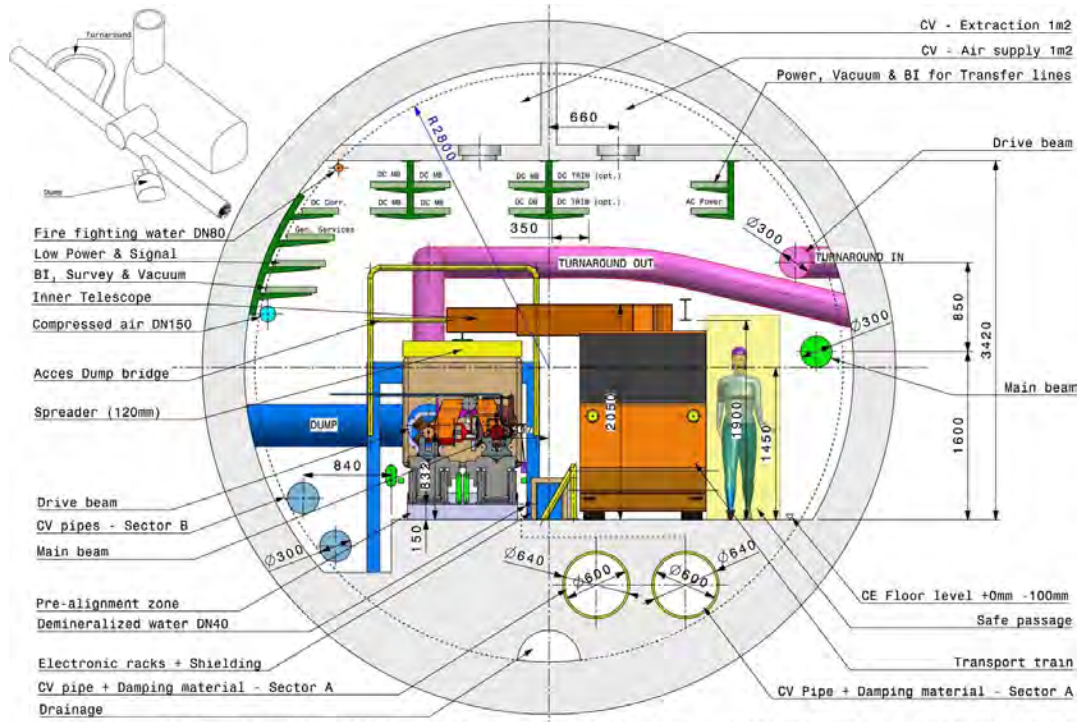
Proposed CLIC tunnel cross section. The main beam linac and the drive beam are installed on individual girders on a common concrete base. Transfer lines carry the main- and drive-beams from the generation complexes to their respective injection points and connect cooling and ventilation facilities [19].
